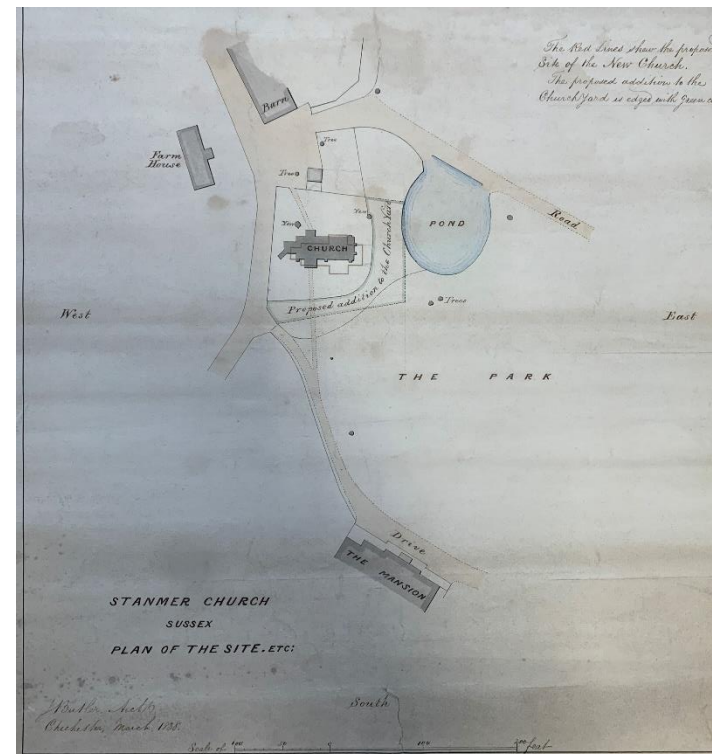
Plan for the rebuilding of Stanmer Church and the well house March 1838, signed by Joseph Butler, Architect (Source: ESRO).
